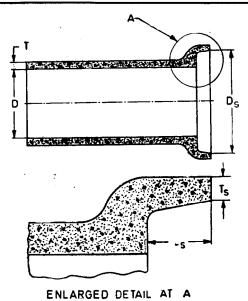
DIMENSIONS OF PERFORATED CONCRETE PIPE
